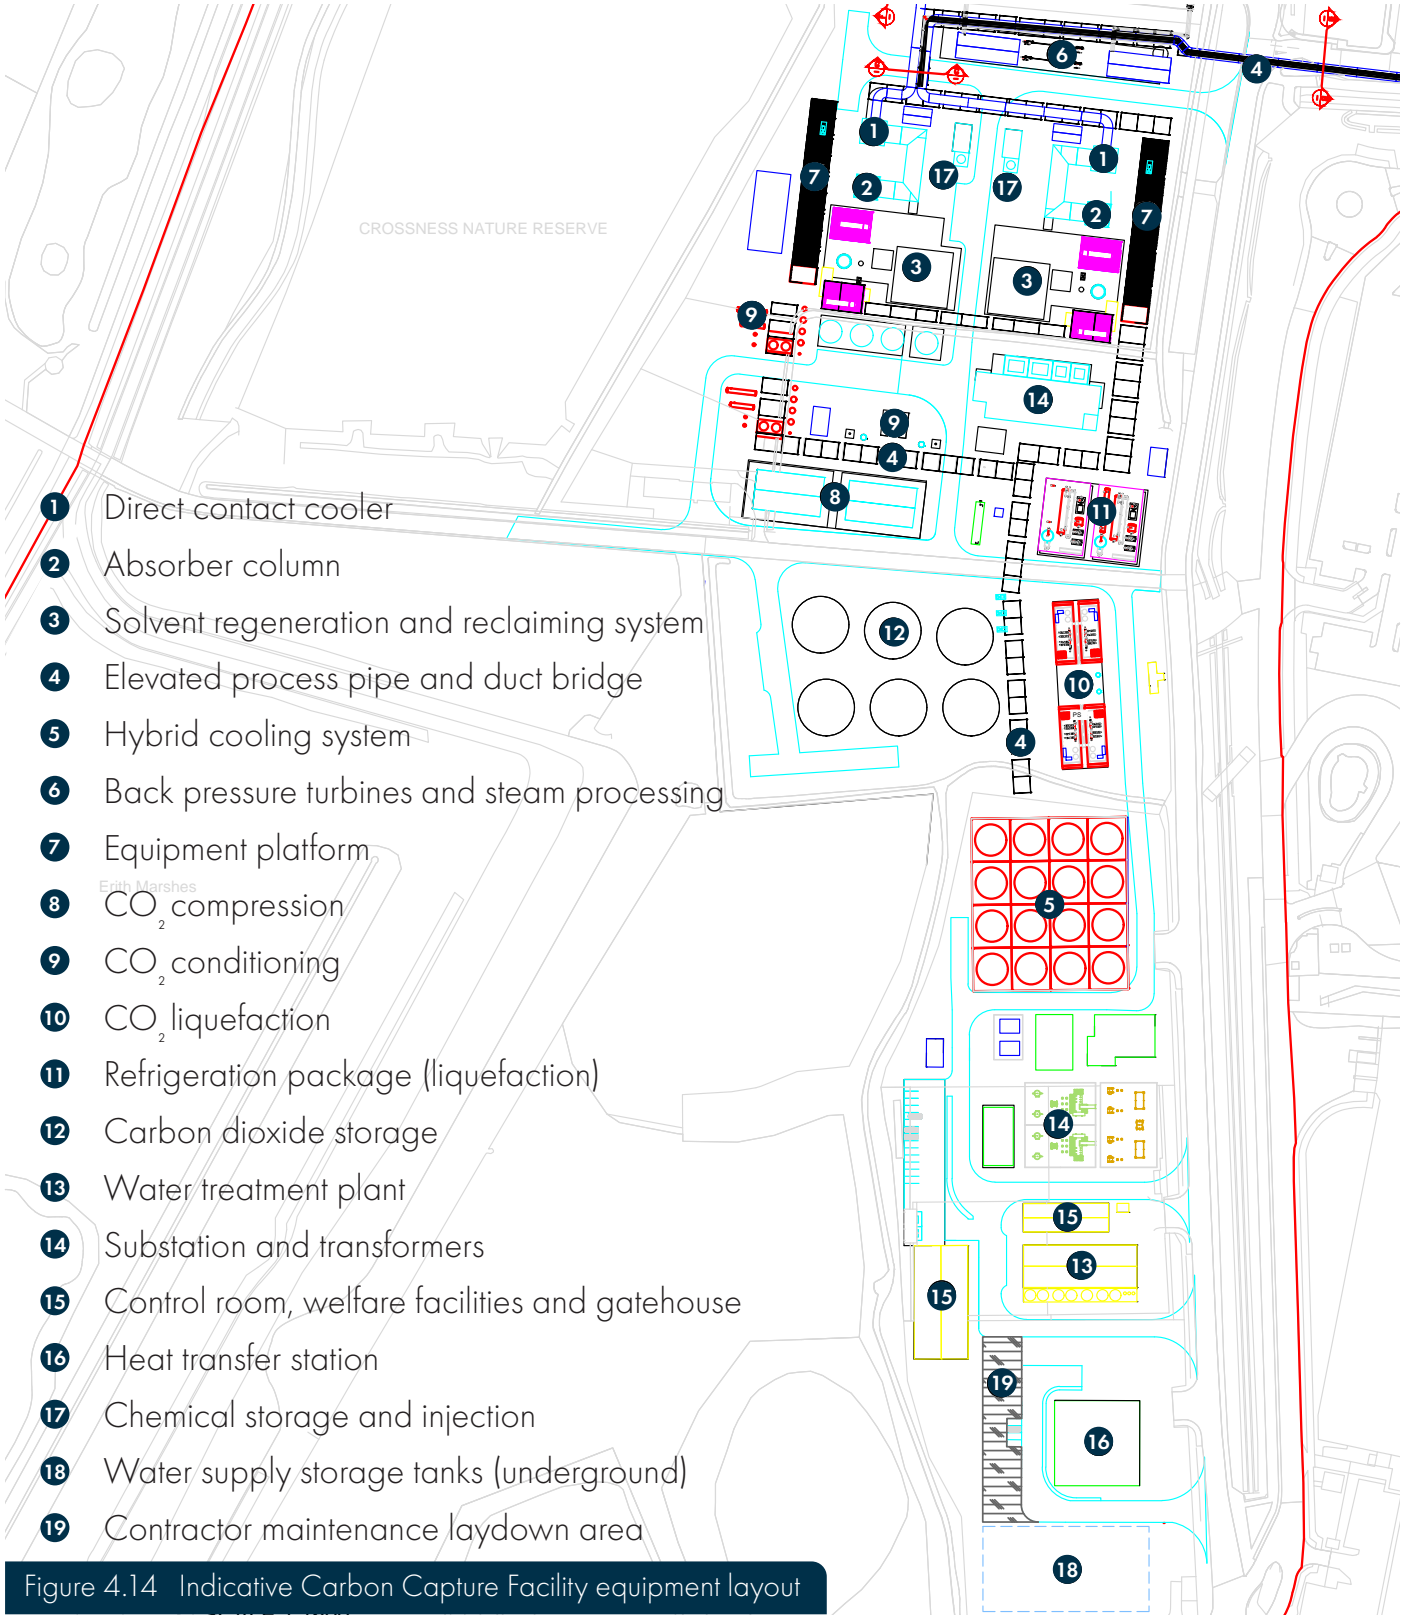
Indicative Carbon Capture Facility equipment layout
